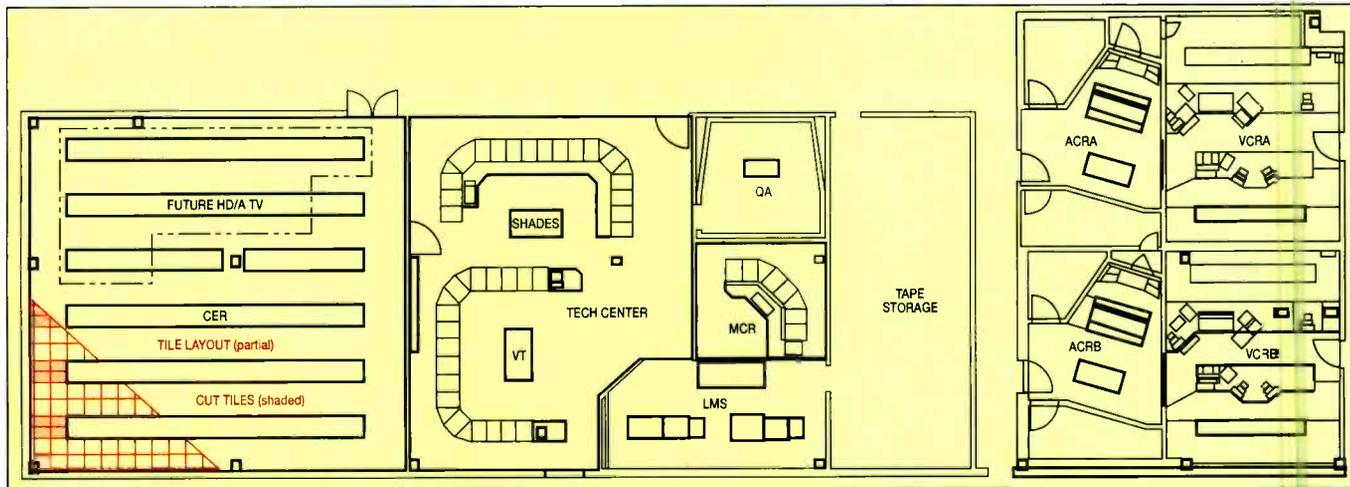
Floor plan of KHOU's technical area. Note the tile layout in the tech center, which provided easy access into racks and required only a few tiles to be cut.
